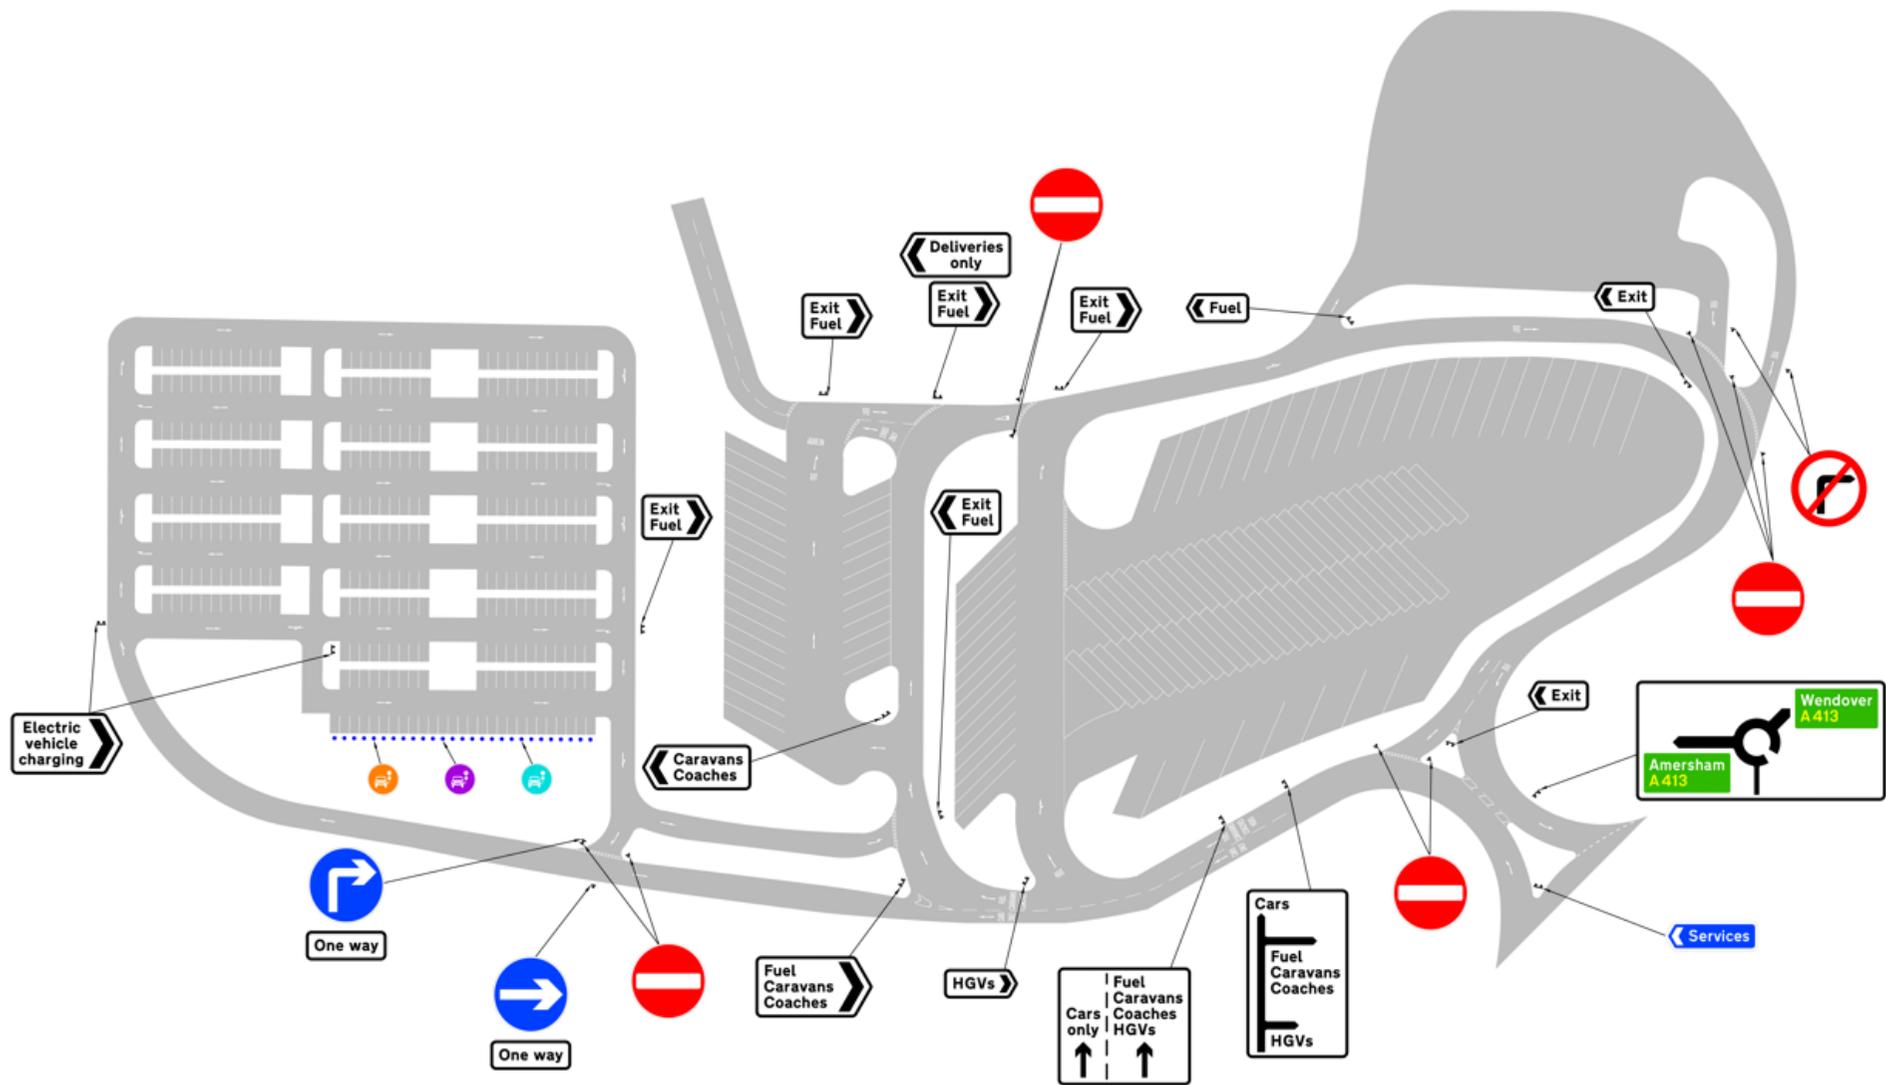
Example of signing and road markings for an internal layout of an MSA
